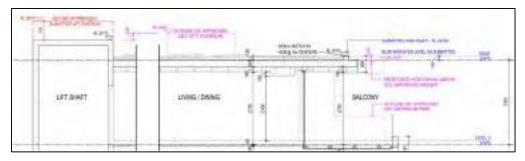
Upper section plan showing new roof height (150mm lower than submitted plans) and lower lift overrun than submitted (reduced 700mm) to RL25.17m
